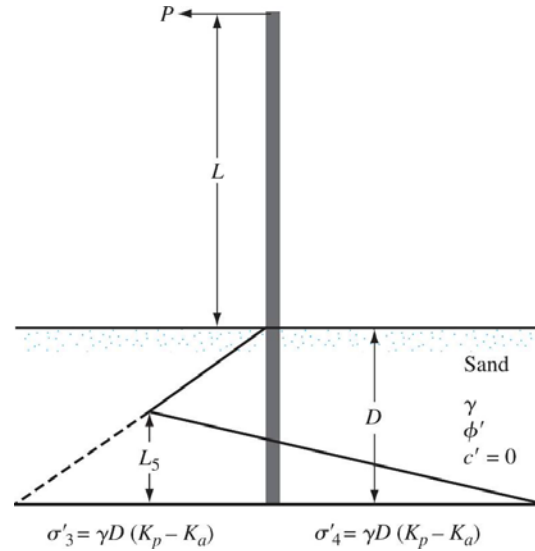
Free cantilever sheet piling penetrating a layer of sand
